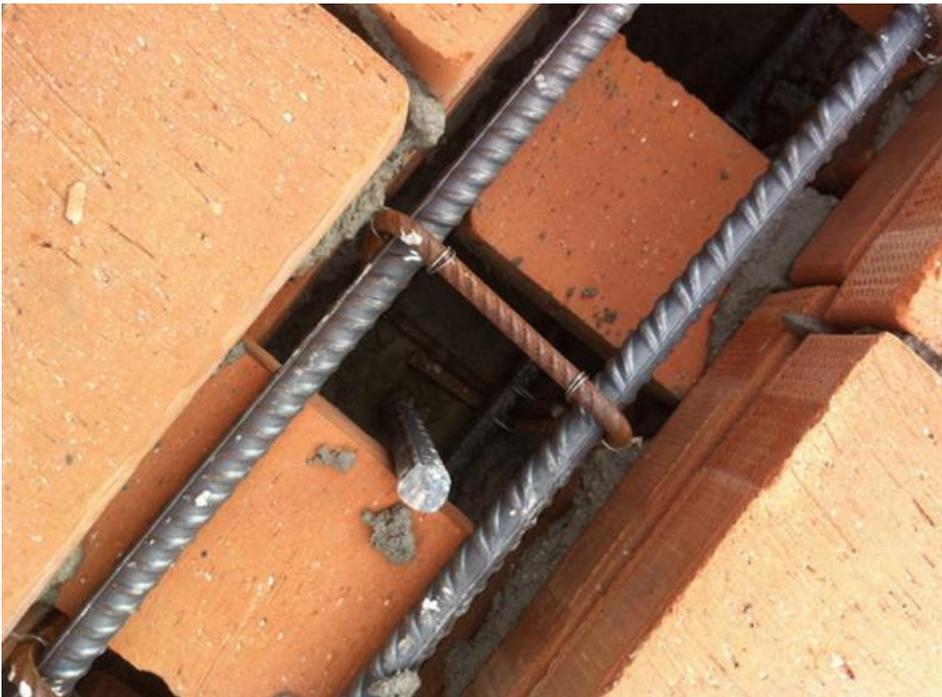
Steel bars of a reinforced masonry curb. ©Vincenzo Fazio
